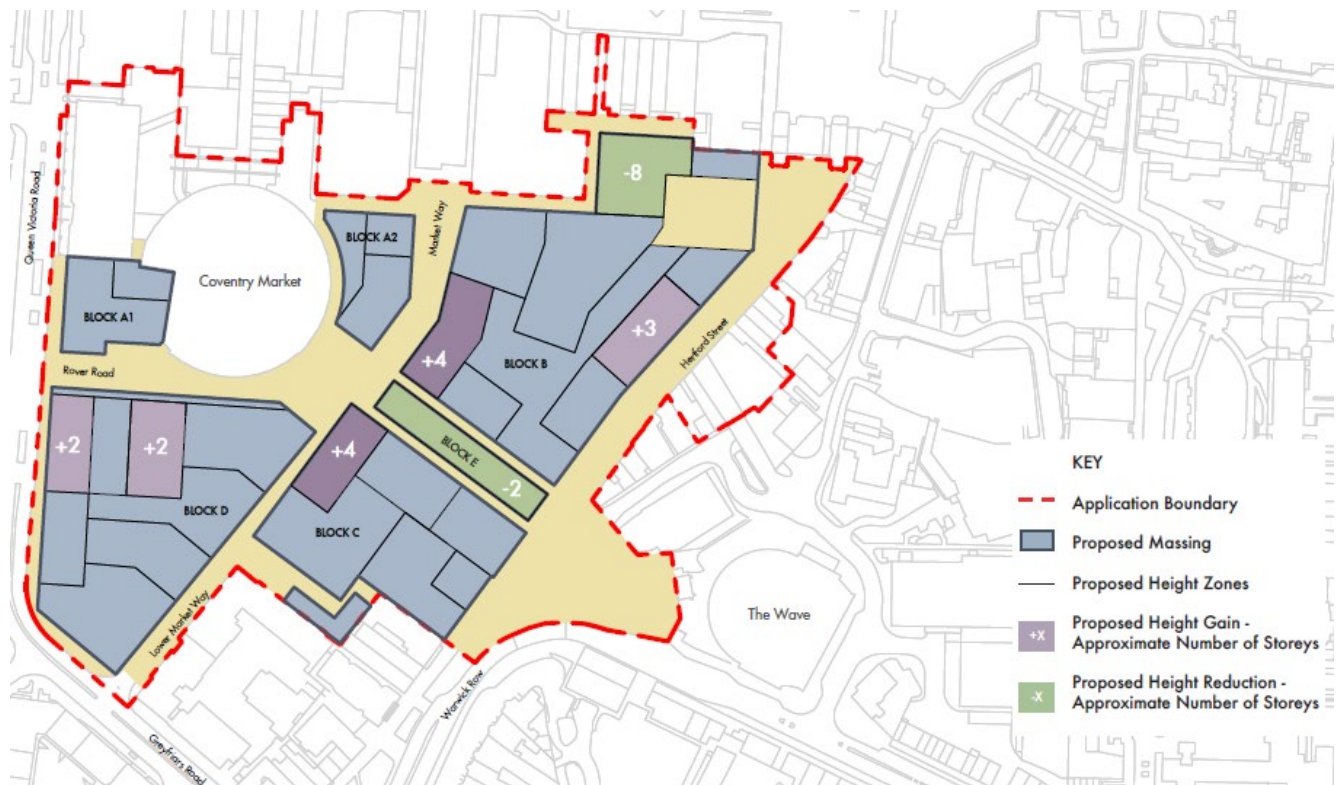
Overview of Proposed Amendments to Layout Parameters of Consented Scheme
